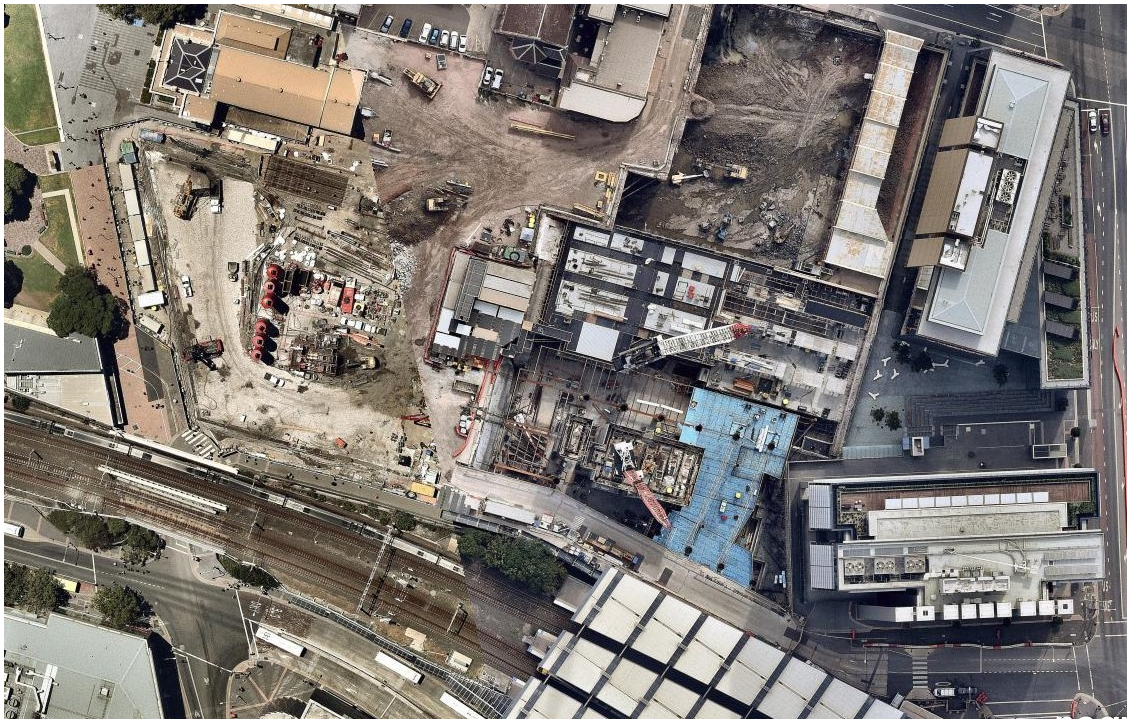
Aerial view of site showing current basement construction underway (Source: Nearmap, 15 April 2018).
